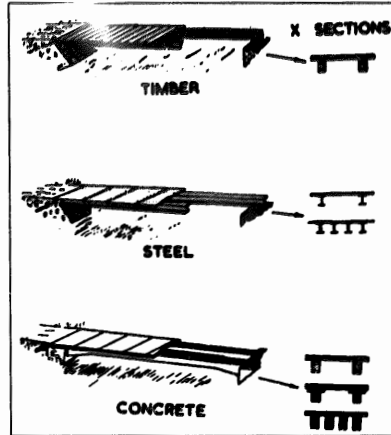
Basic beam bridges. Many highway bridges are merely larger versions of this simple design.
